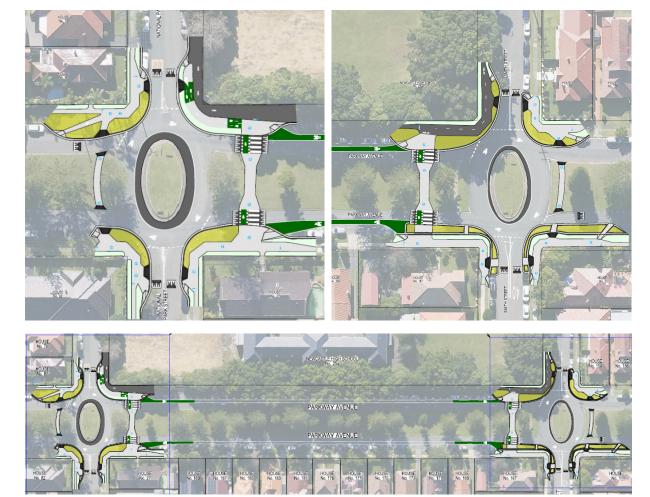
Parkway Avenue Roundabout Upgrades²
